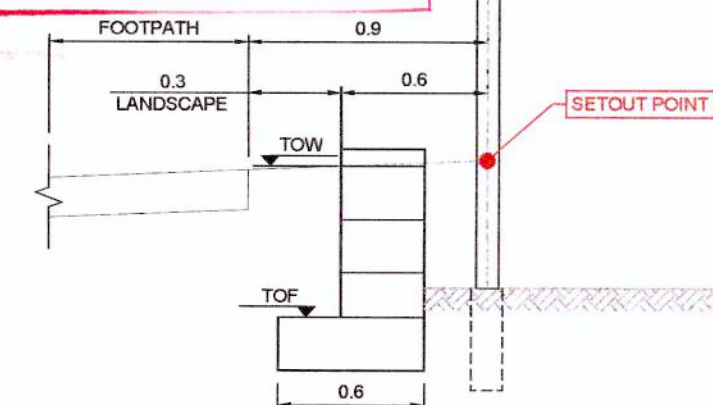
DETAIL- RETAINING WALL UP TO 0.9m HIGH
